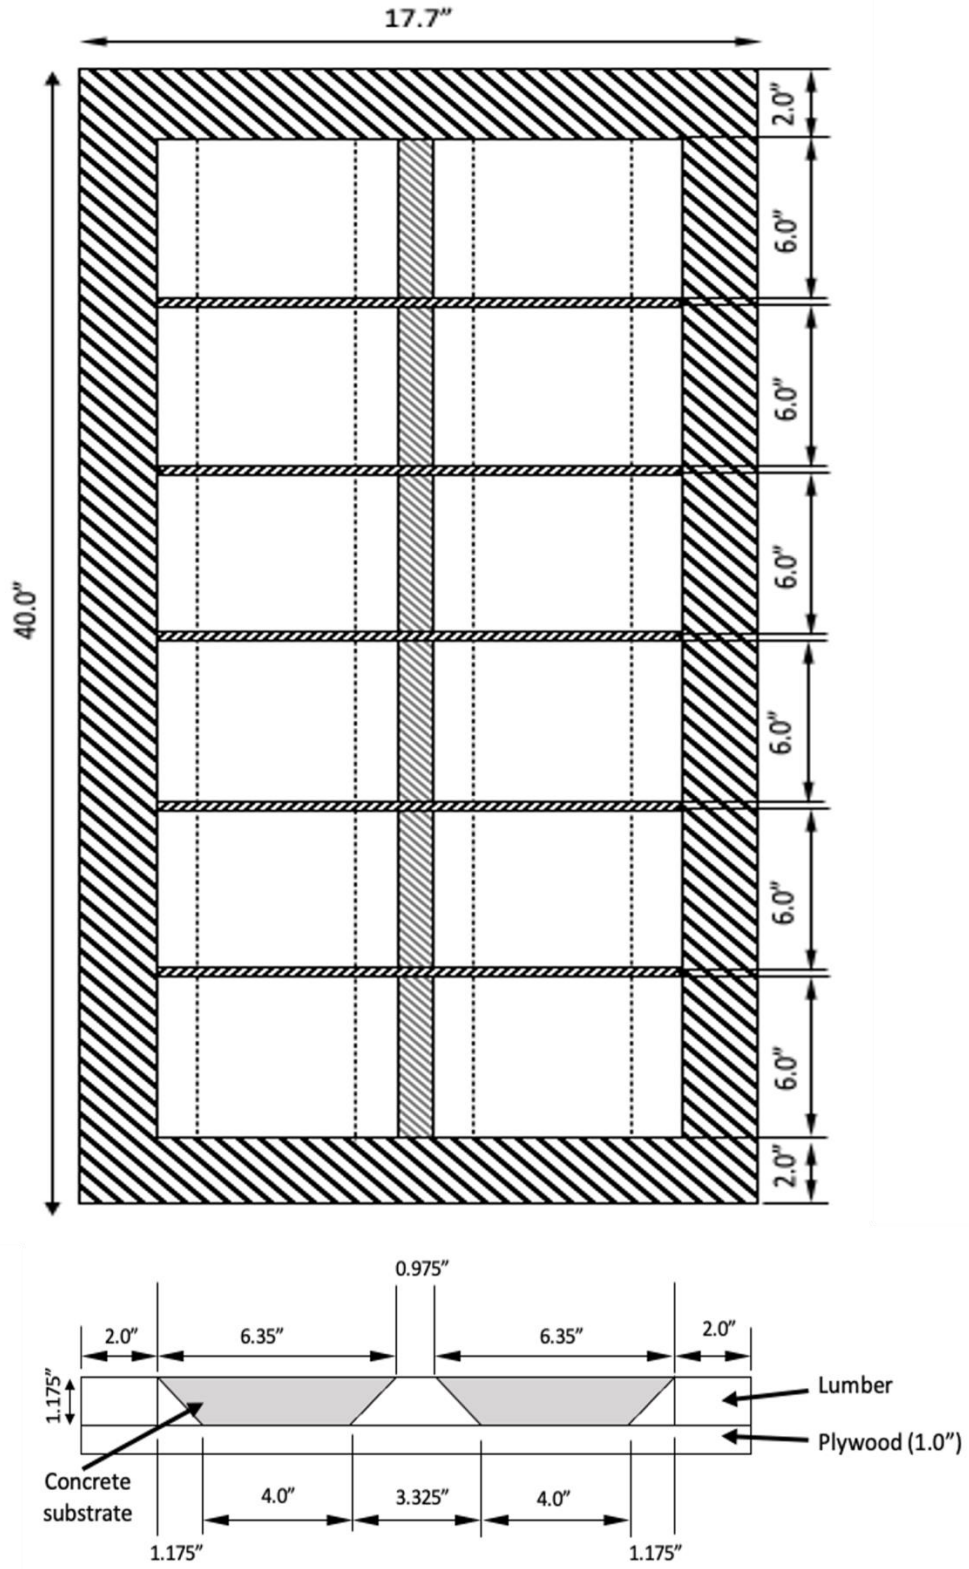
Plan view and elevation of the butterfly specimen mold
